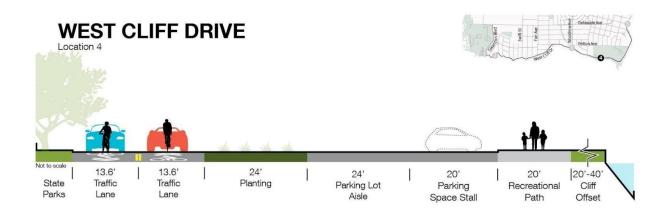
West Cliff Drive Alternative 1 Enhancements at Cross Section of State Parks Parking Lot A
